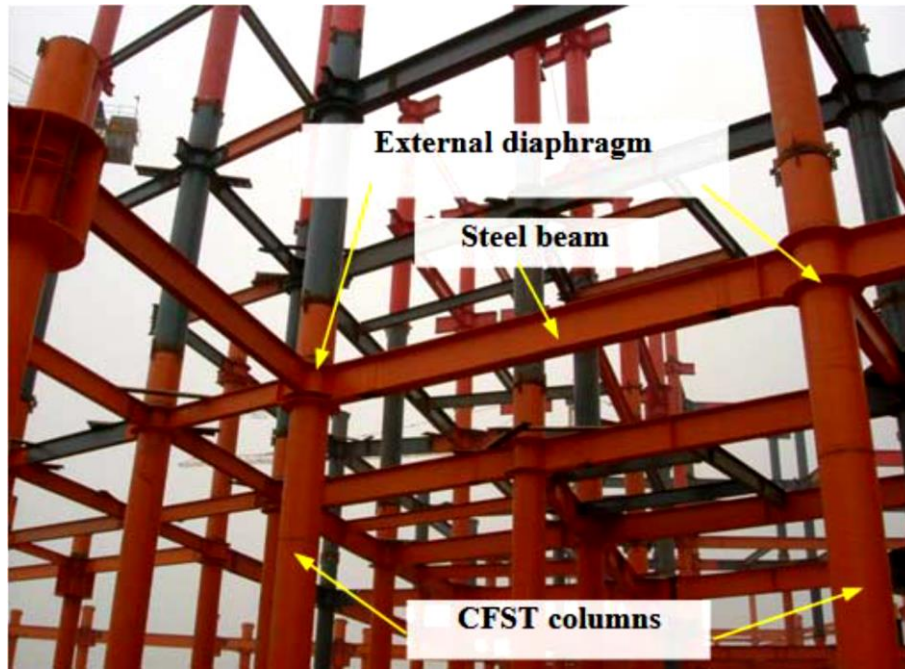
A CFST composite frame under construction (Lin-Hai et al., 2011)
